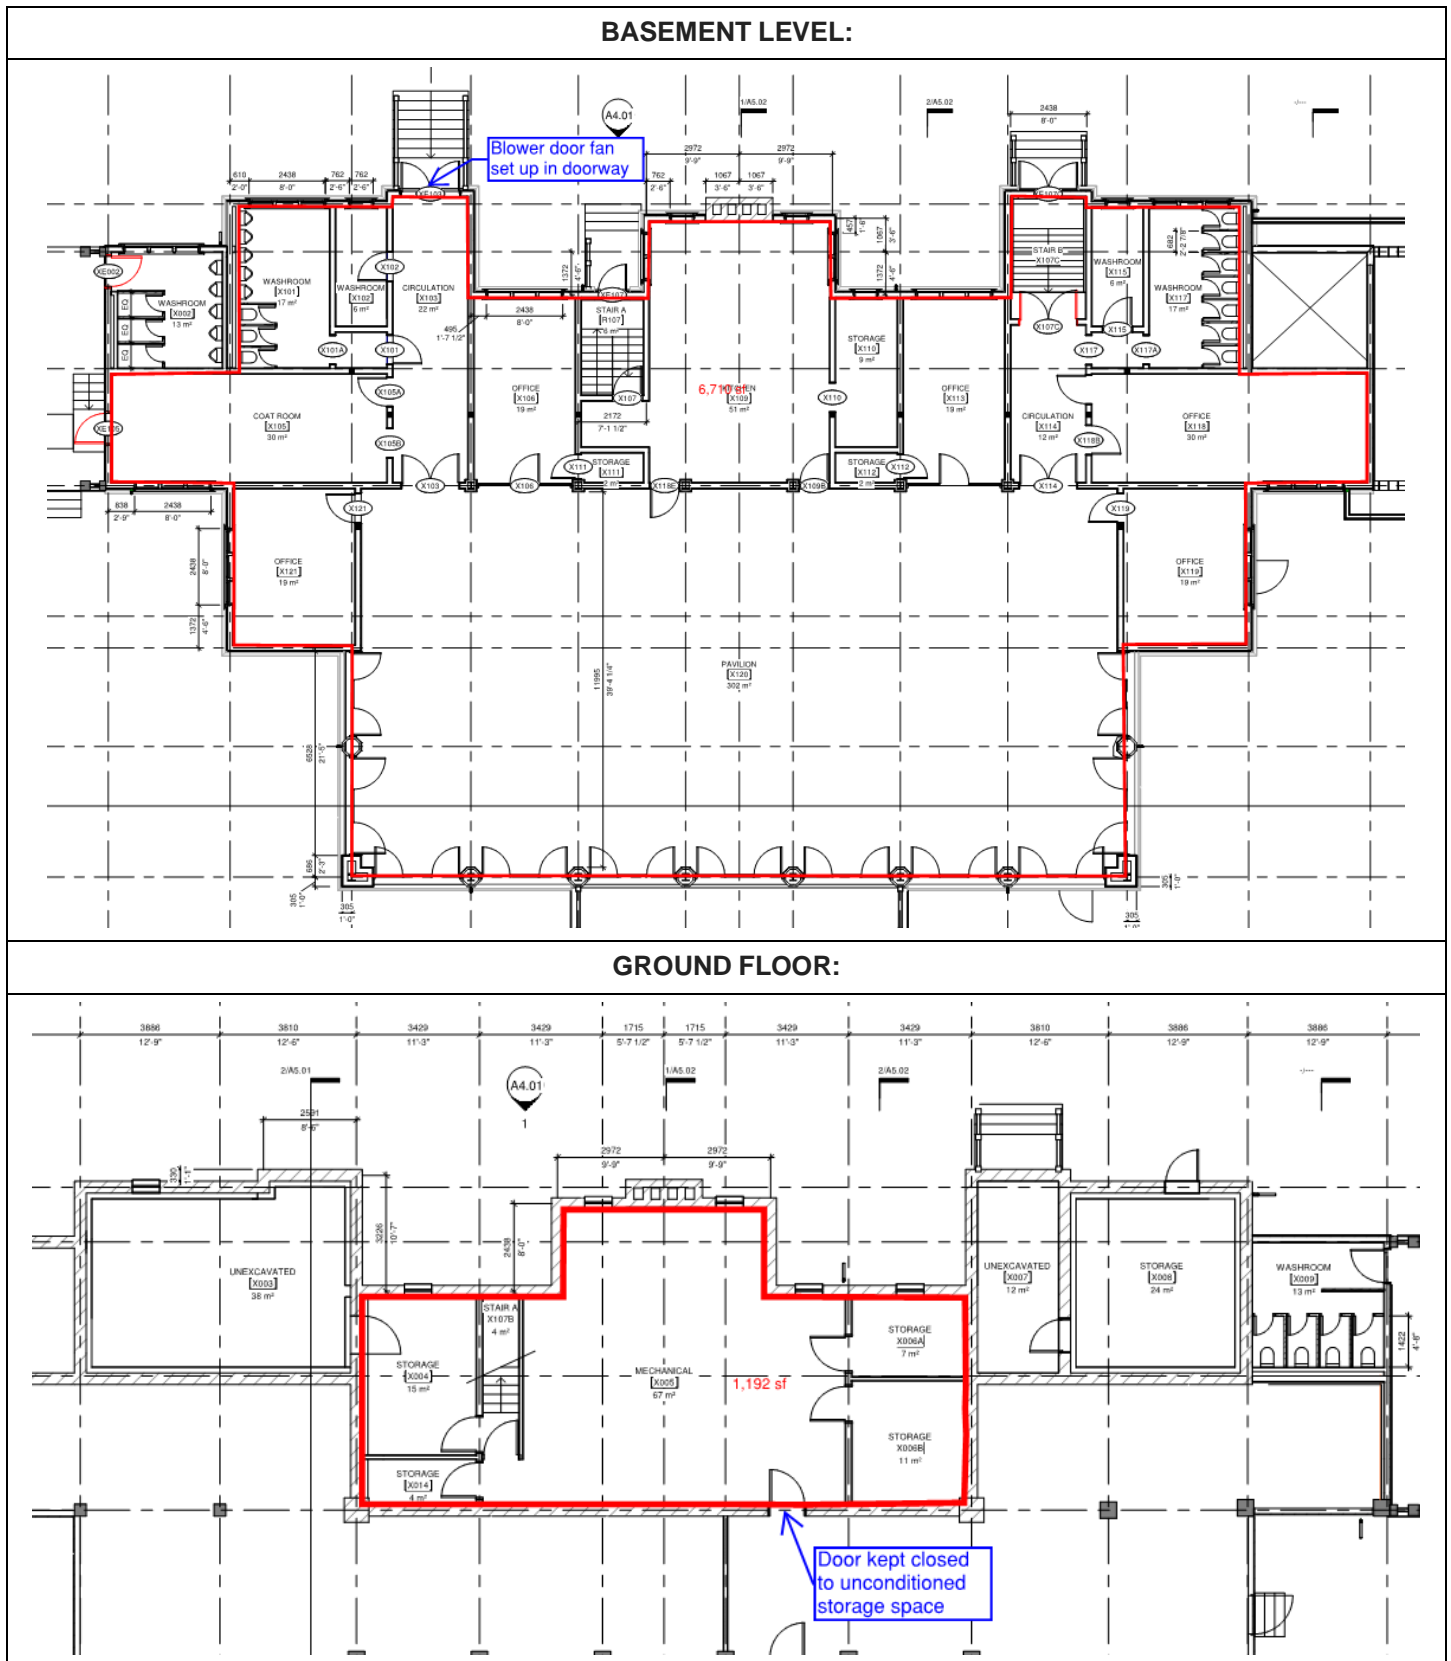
Plan view drawings showing the test zone boundary, outlined in red.
